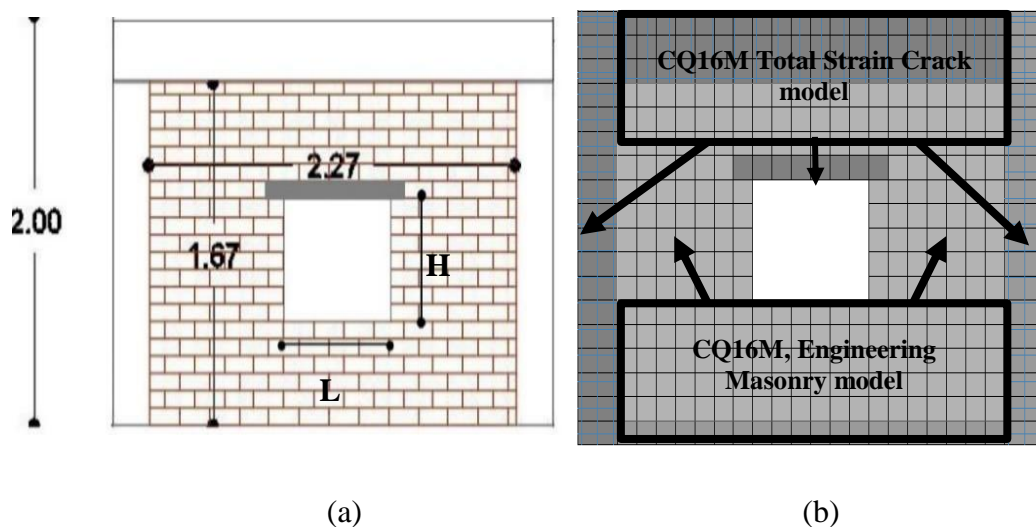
(a) Geometry of the masonry infill wall with central opening and (b) details of FE masonry-infilled frame model with central opening.
